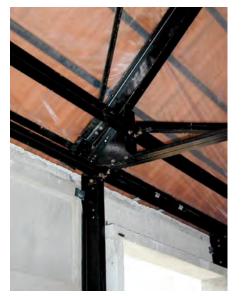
Maison Phénix during construction, showing the roof details for a single storey house
